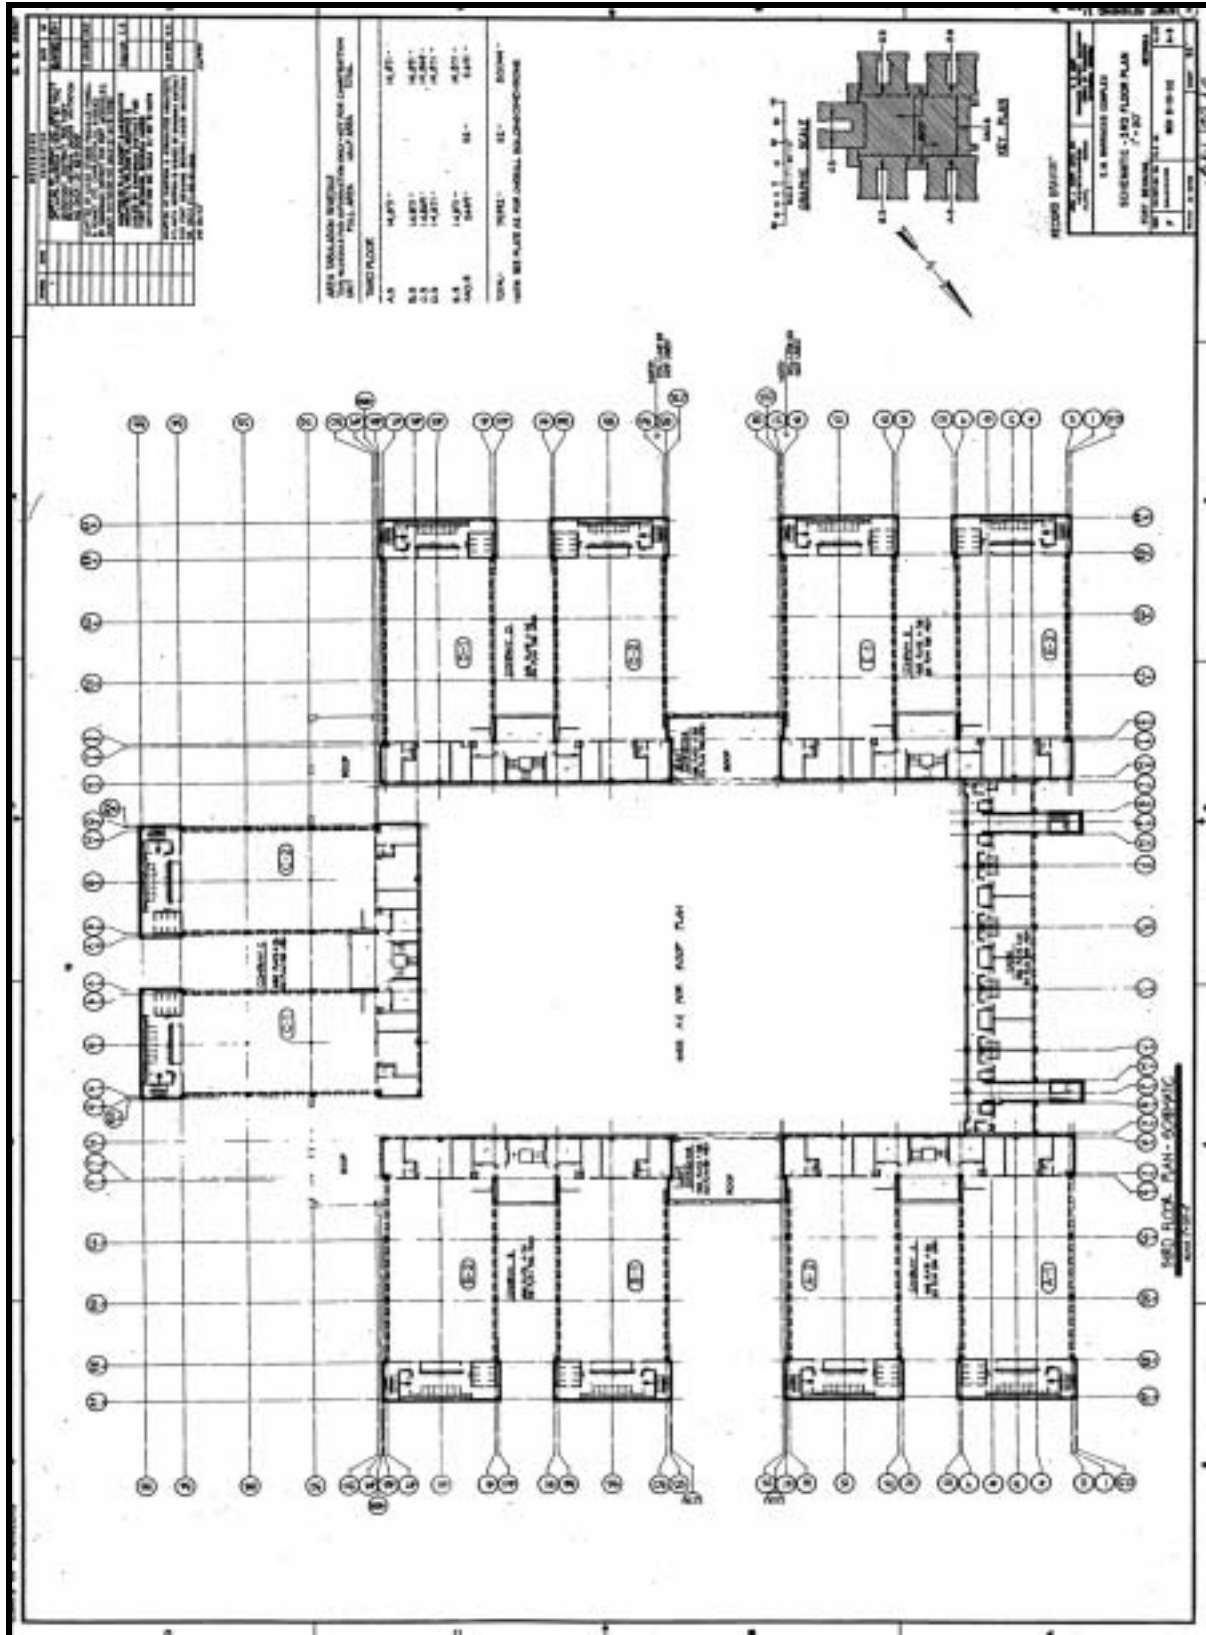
Starship barracks, third floor plan (ca. 1974, revised 1985) (Engineering, Ft. Benning).
